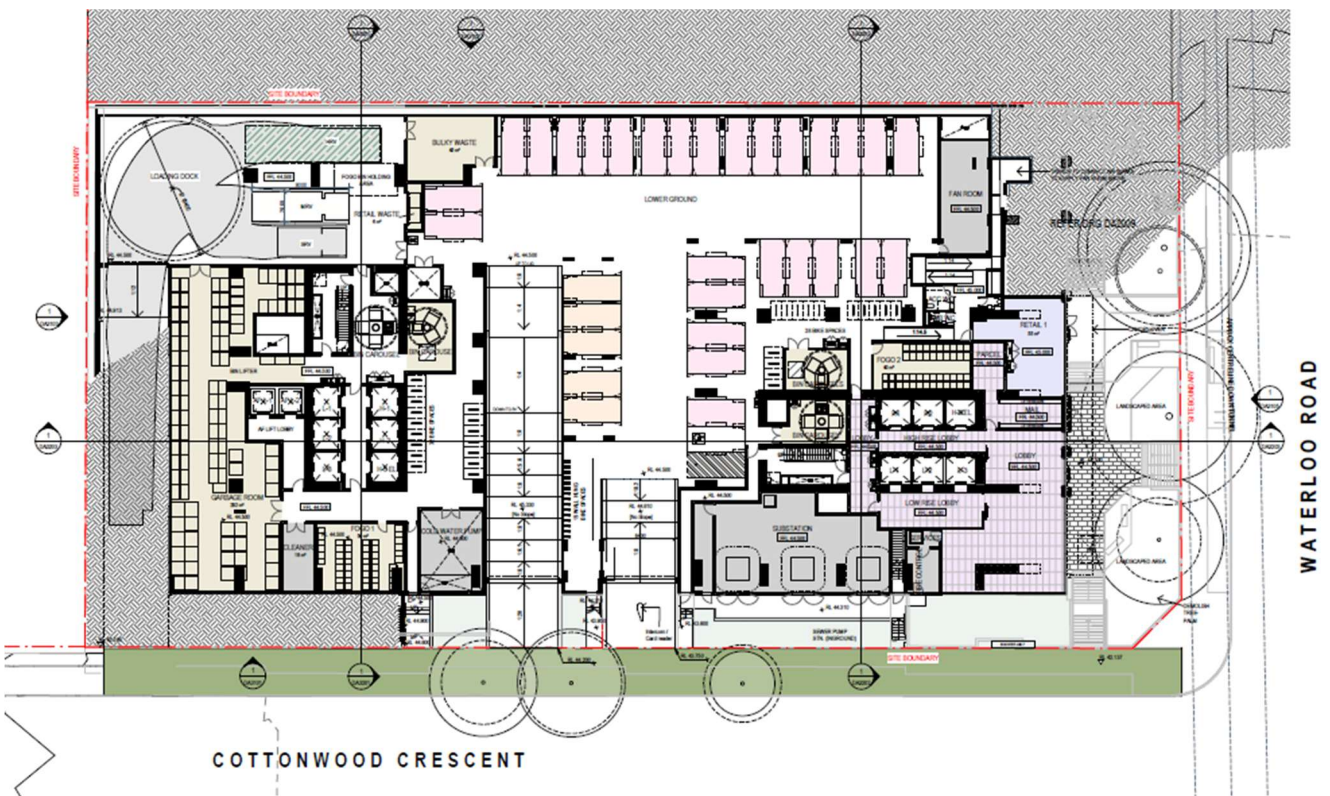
Extract of proposed plans: Lower Ground Floor (DA2007).
